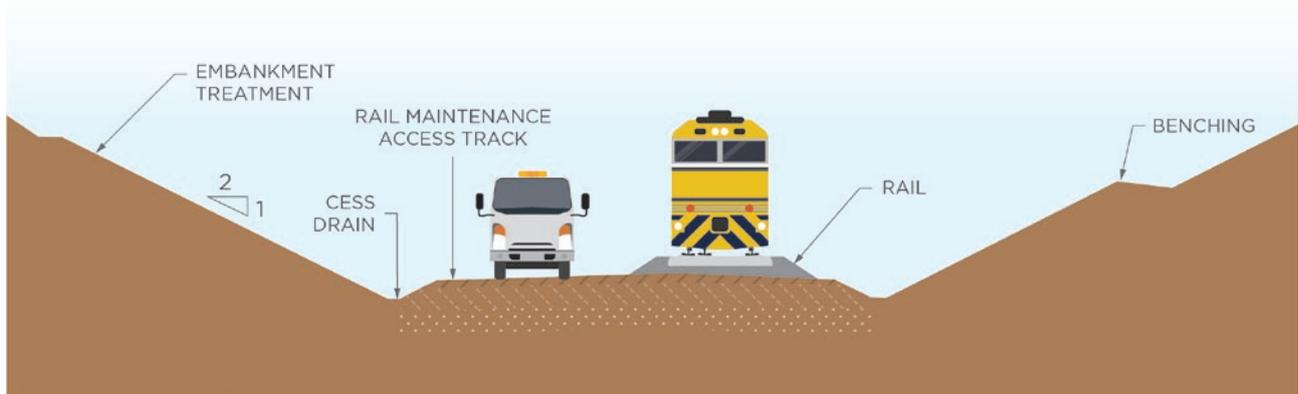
TYPICAL SECTIONAL DIAGRAM OF RAIL FORMATION SHOWING RAIL MAINTENANCE ACCESS TRACK
